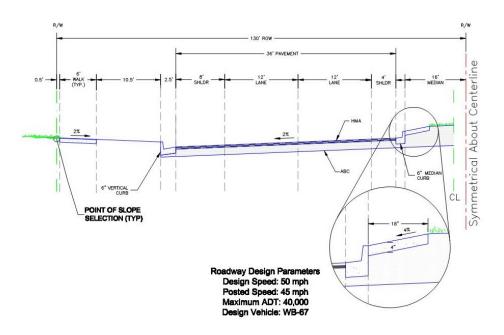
Urban Principal 4-Lane Arterial Roadway Standard Cross Section
